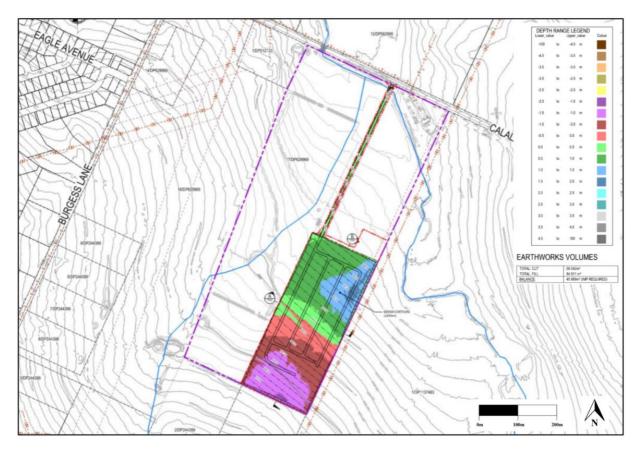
EXTRACT OF EARTHWORKS CUT AND FILL PLAN Source: Sky Engineering & Project Management
